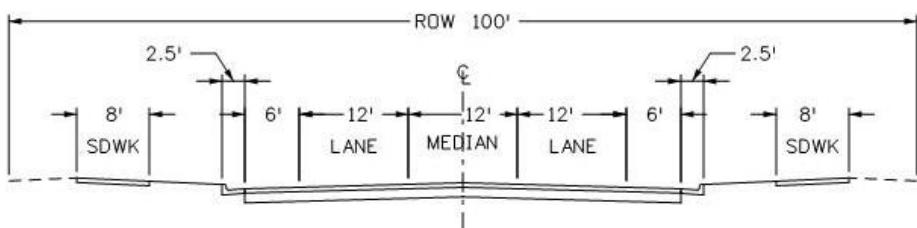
Proposed Eastonville Road Cross-Section North of Stapleton Drive
